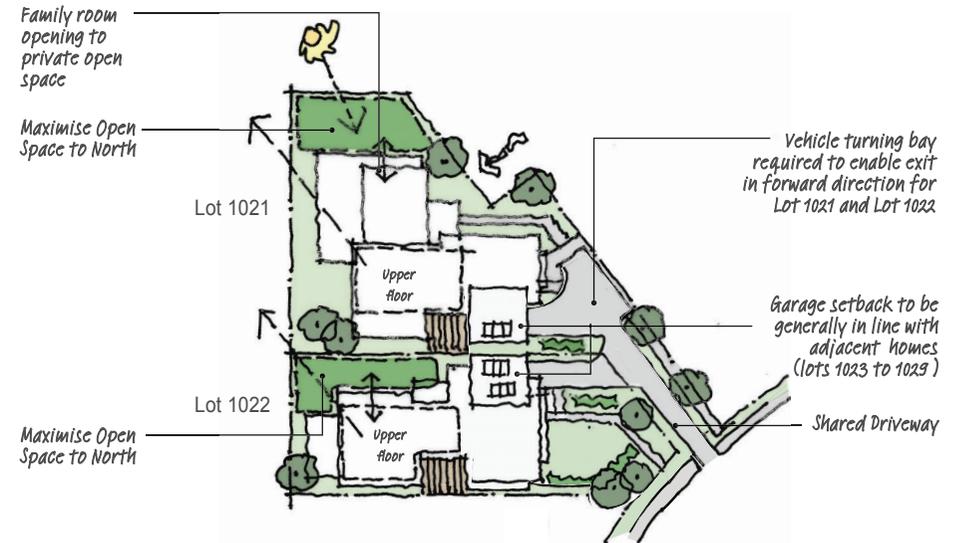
Potential site planning arrangement for Lots 1021 and 1022
